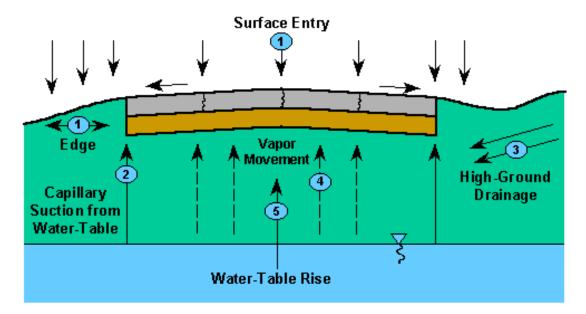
Ways Water Infiltrates to the Pavement Structure (ACPA, 2013).
